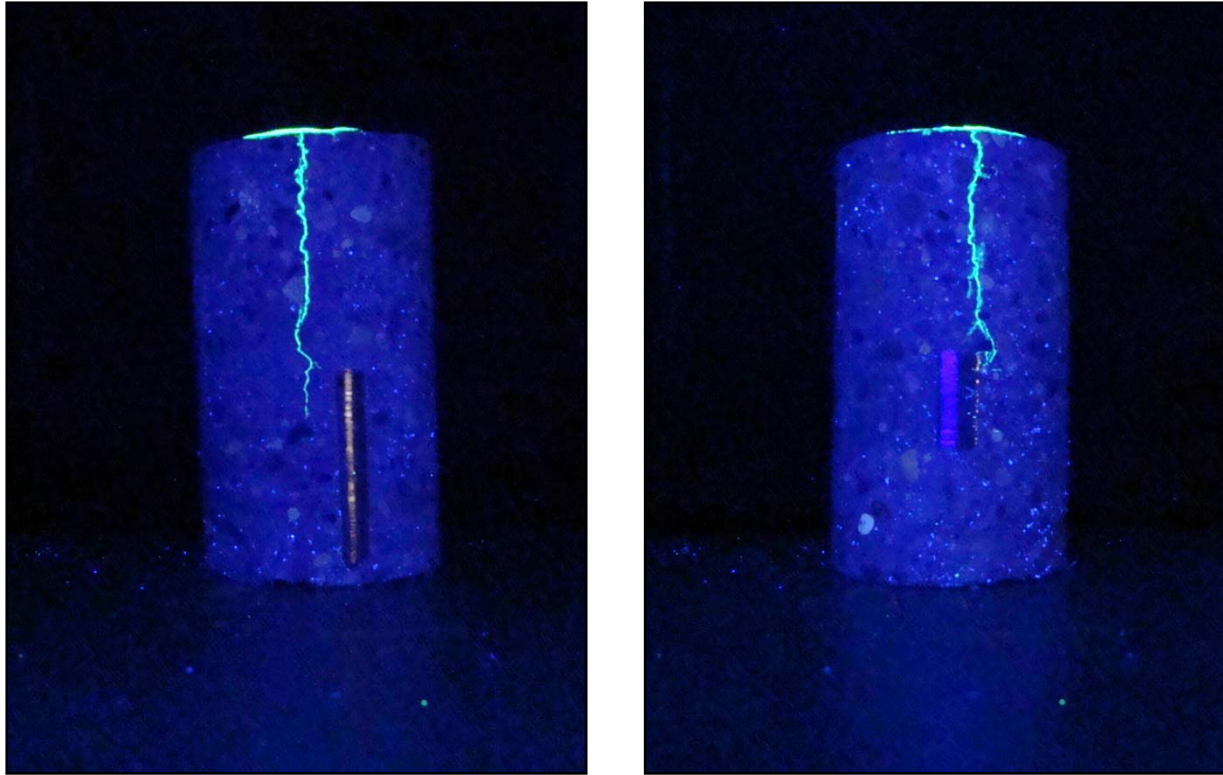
Core LS1 (left) northeast elevation; (right) southwest elevation
